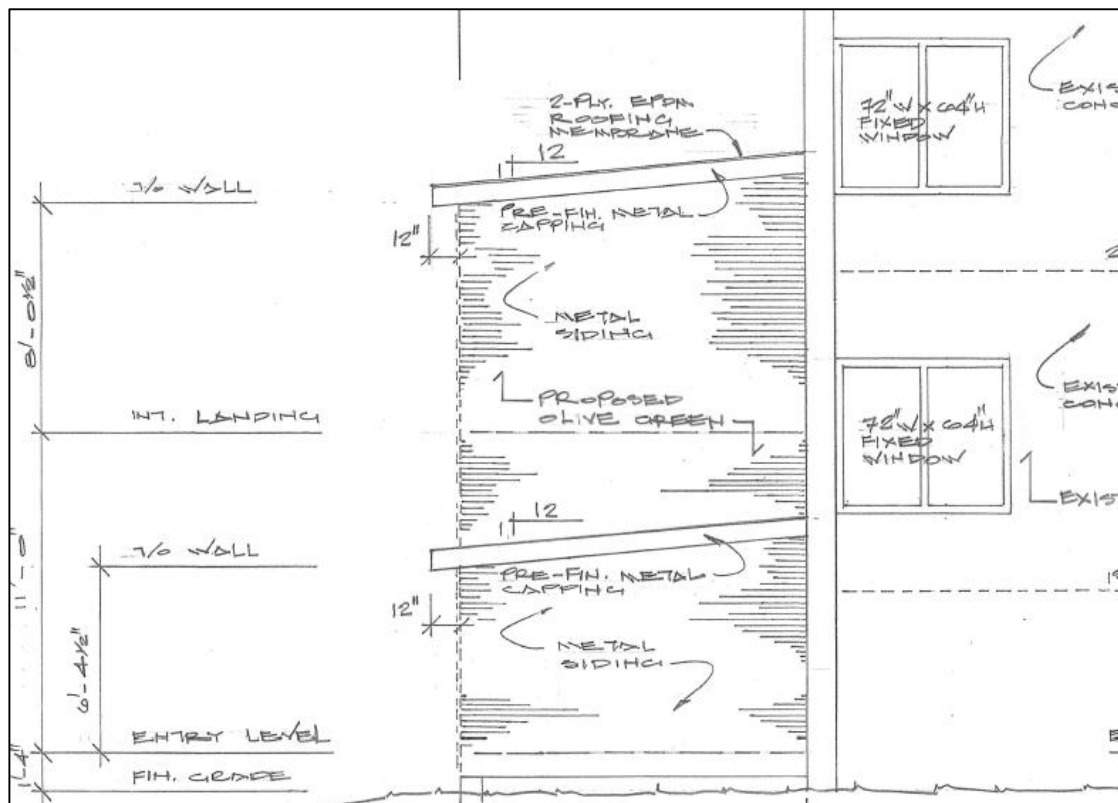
Proposed pre-finished steel cladding. Source: Manufacturer's brochure.
